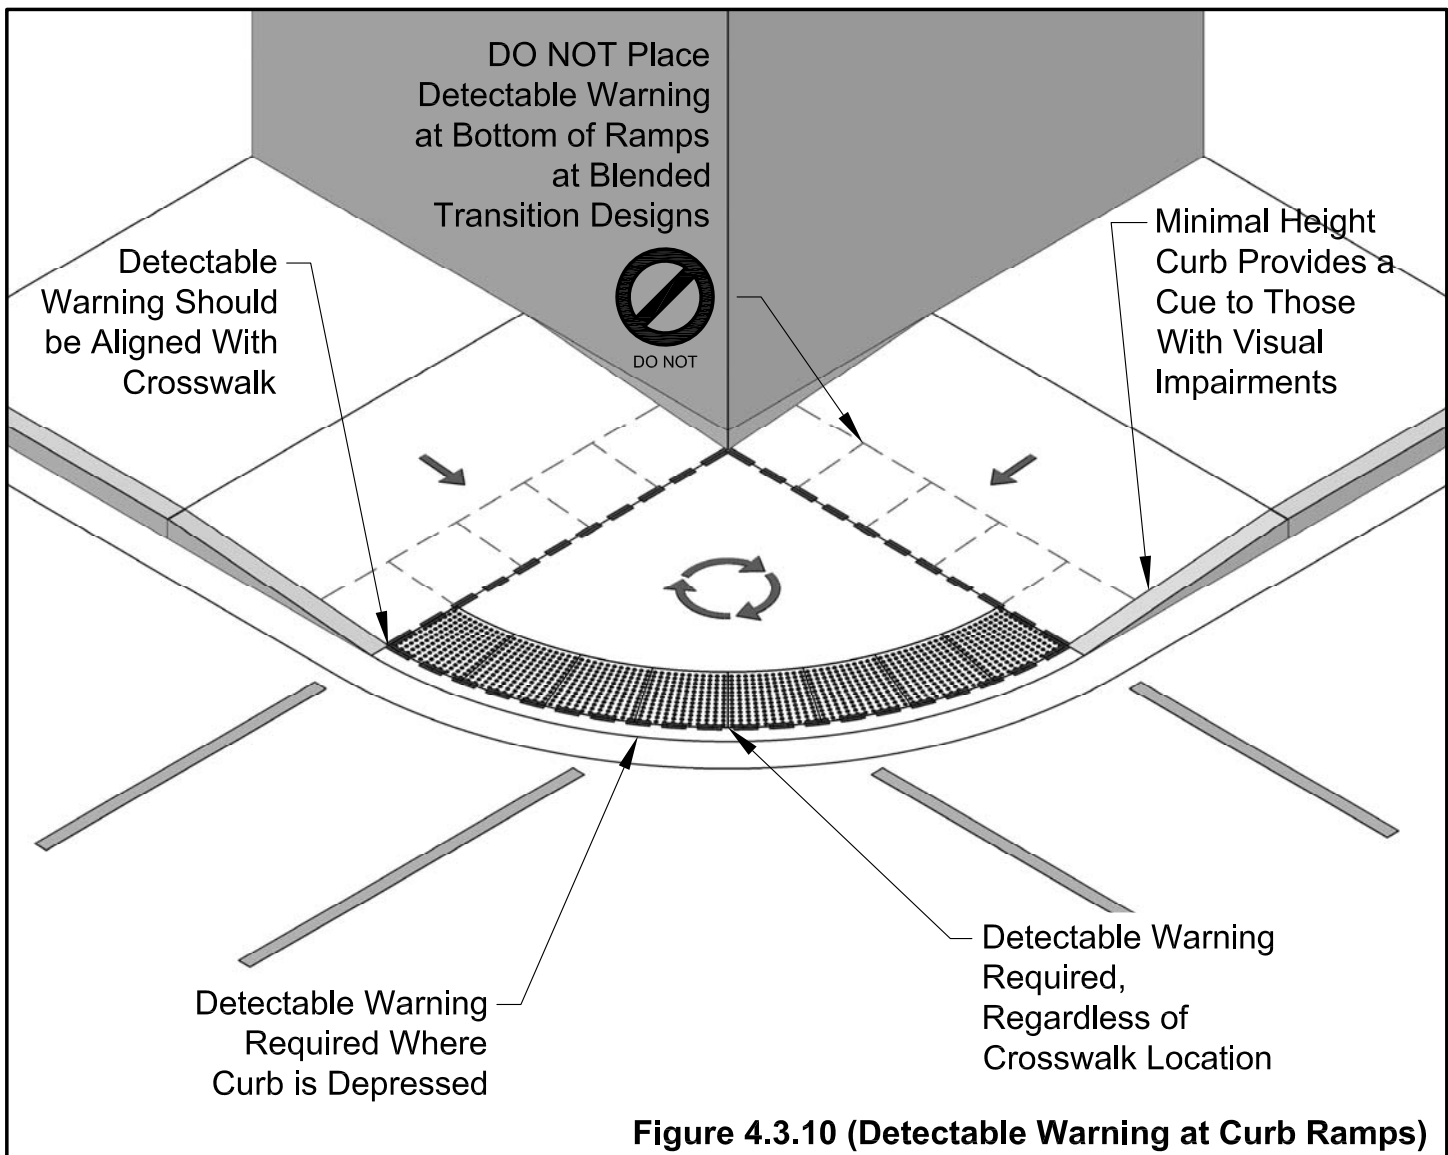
(Detectable Warning at Curb Ramps)
